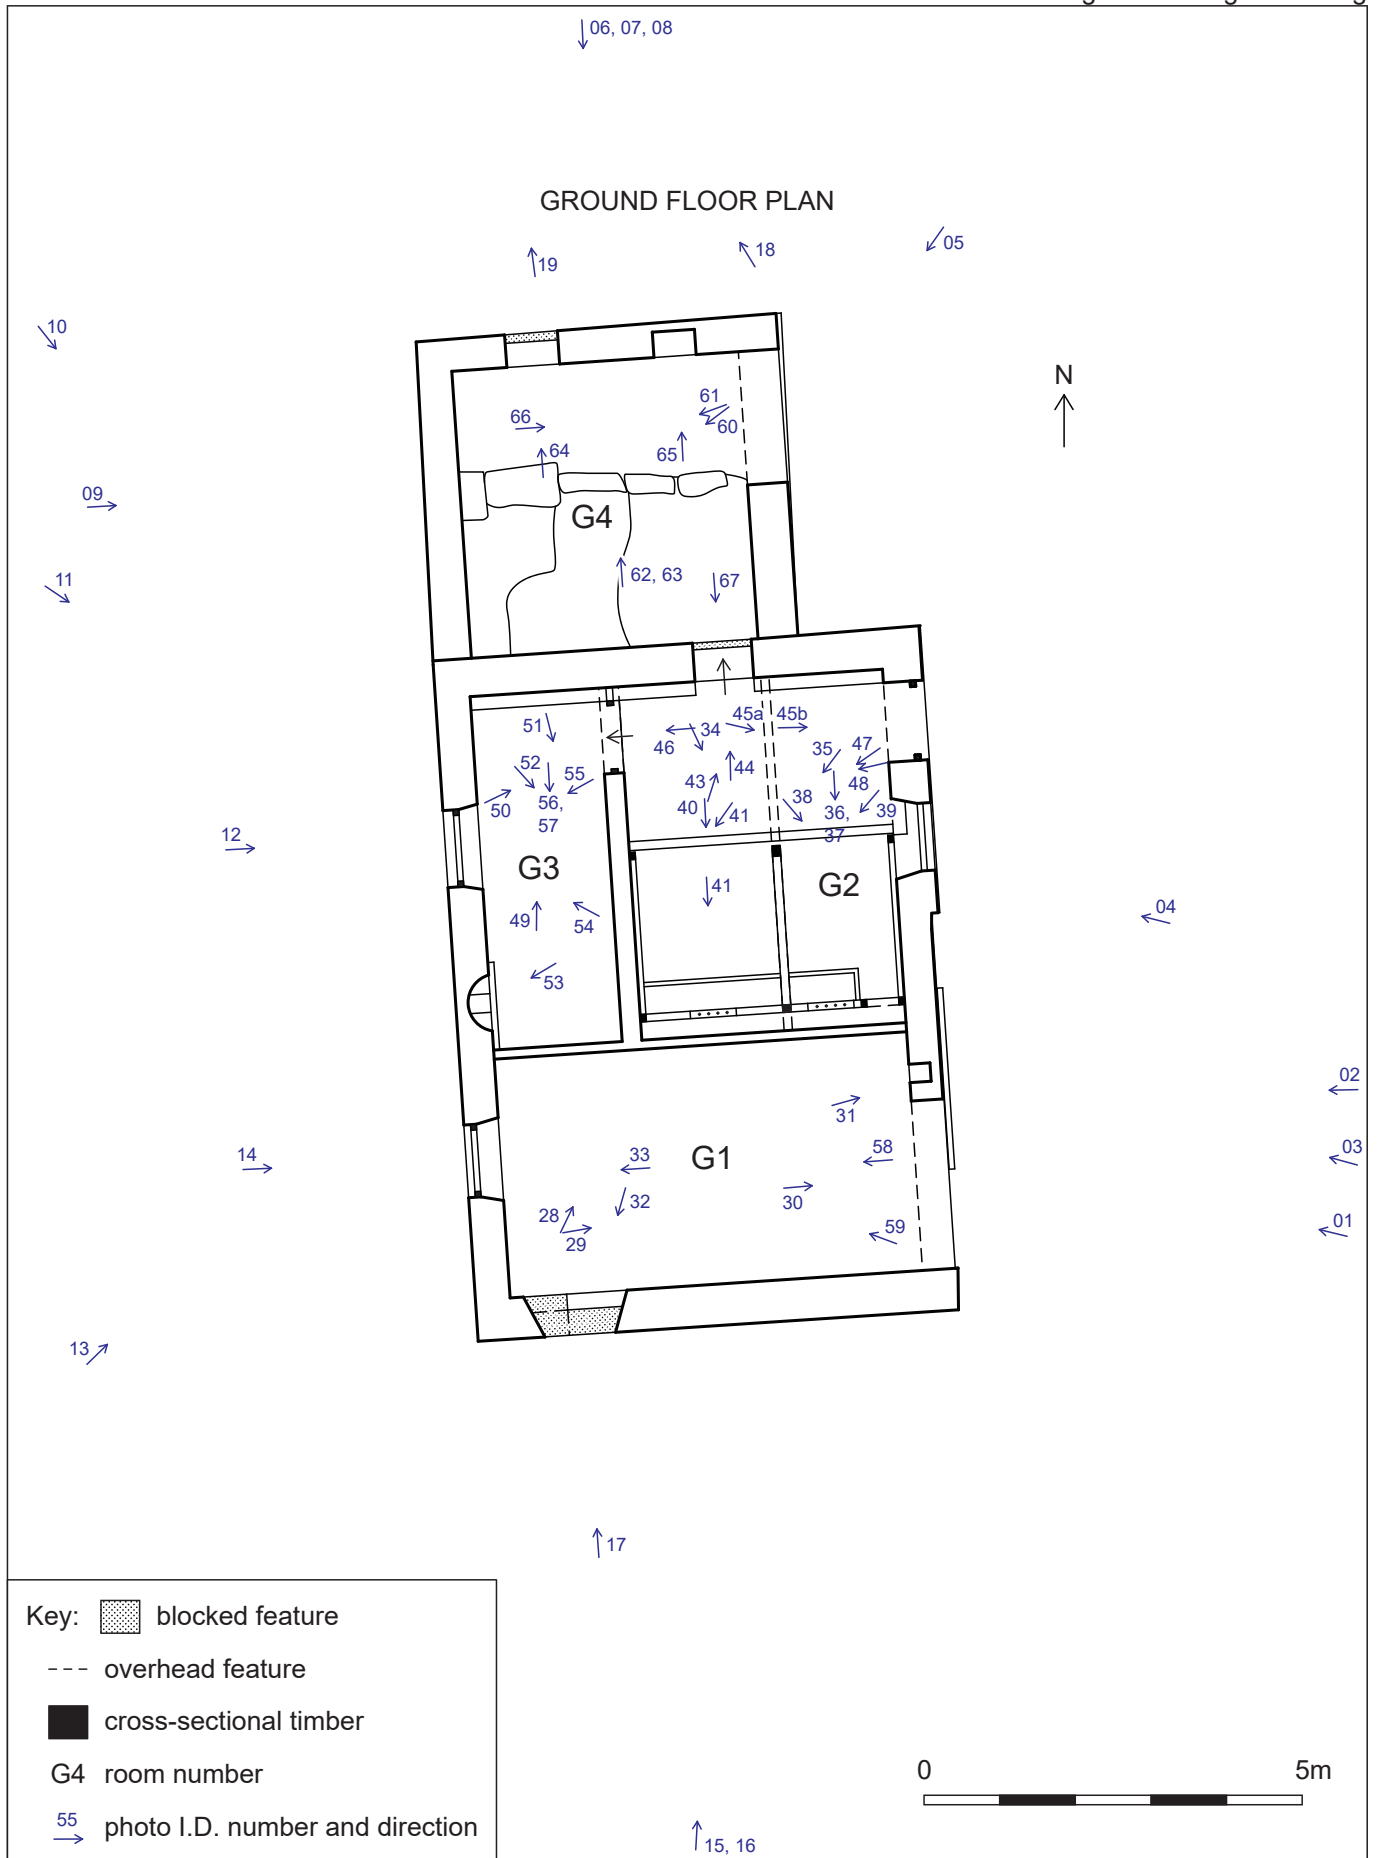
Ground floor plan, showing the location and direction of photographs taken
